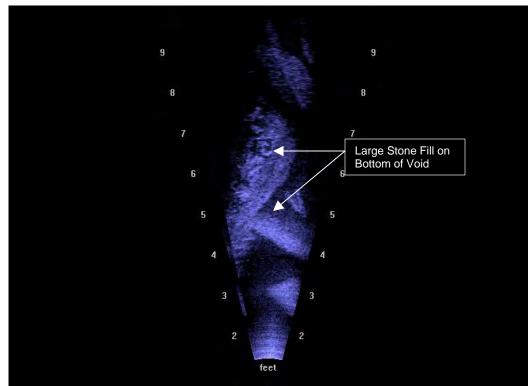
Pier 2, west face, south end, sonar image from interior of the void showing large stone fill.
